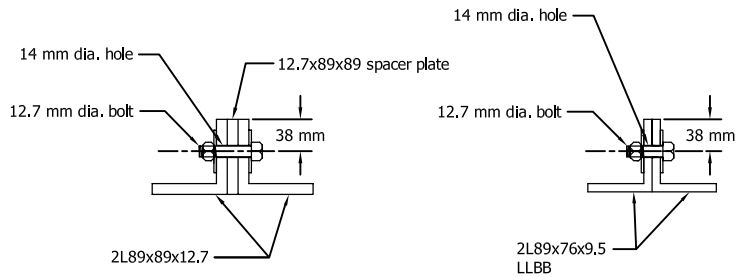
Truss-bridge details E and F (metric sizes)
